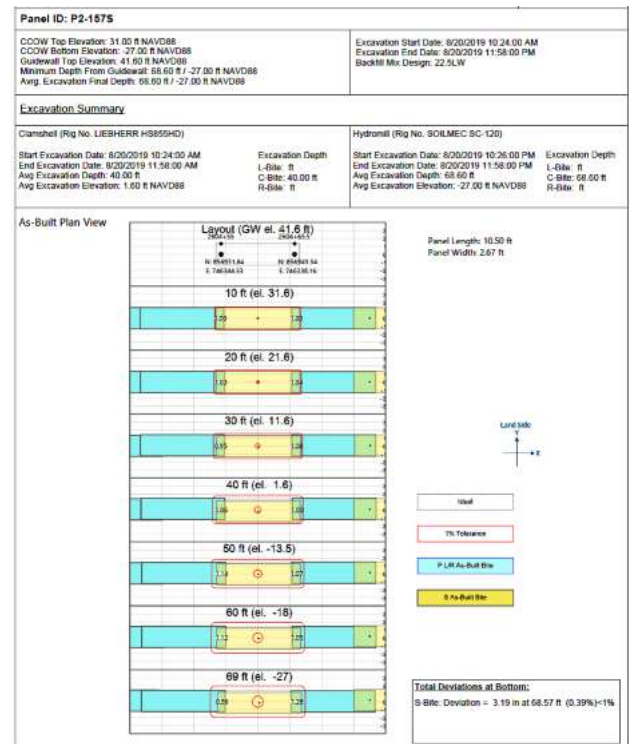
Element Report showing as-built position and overlap of diaphragm wall panel
